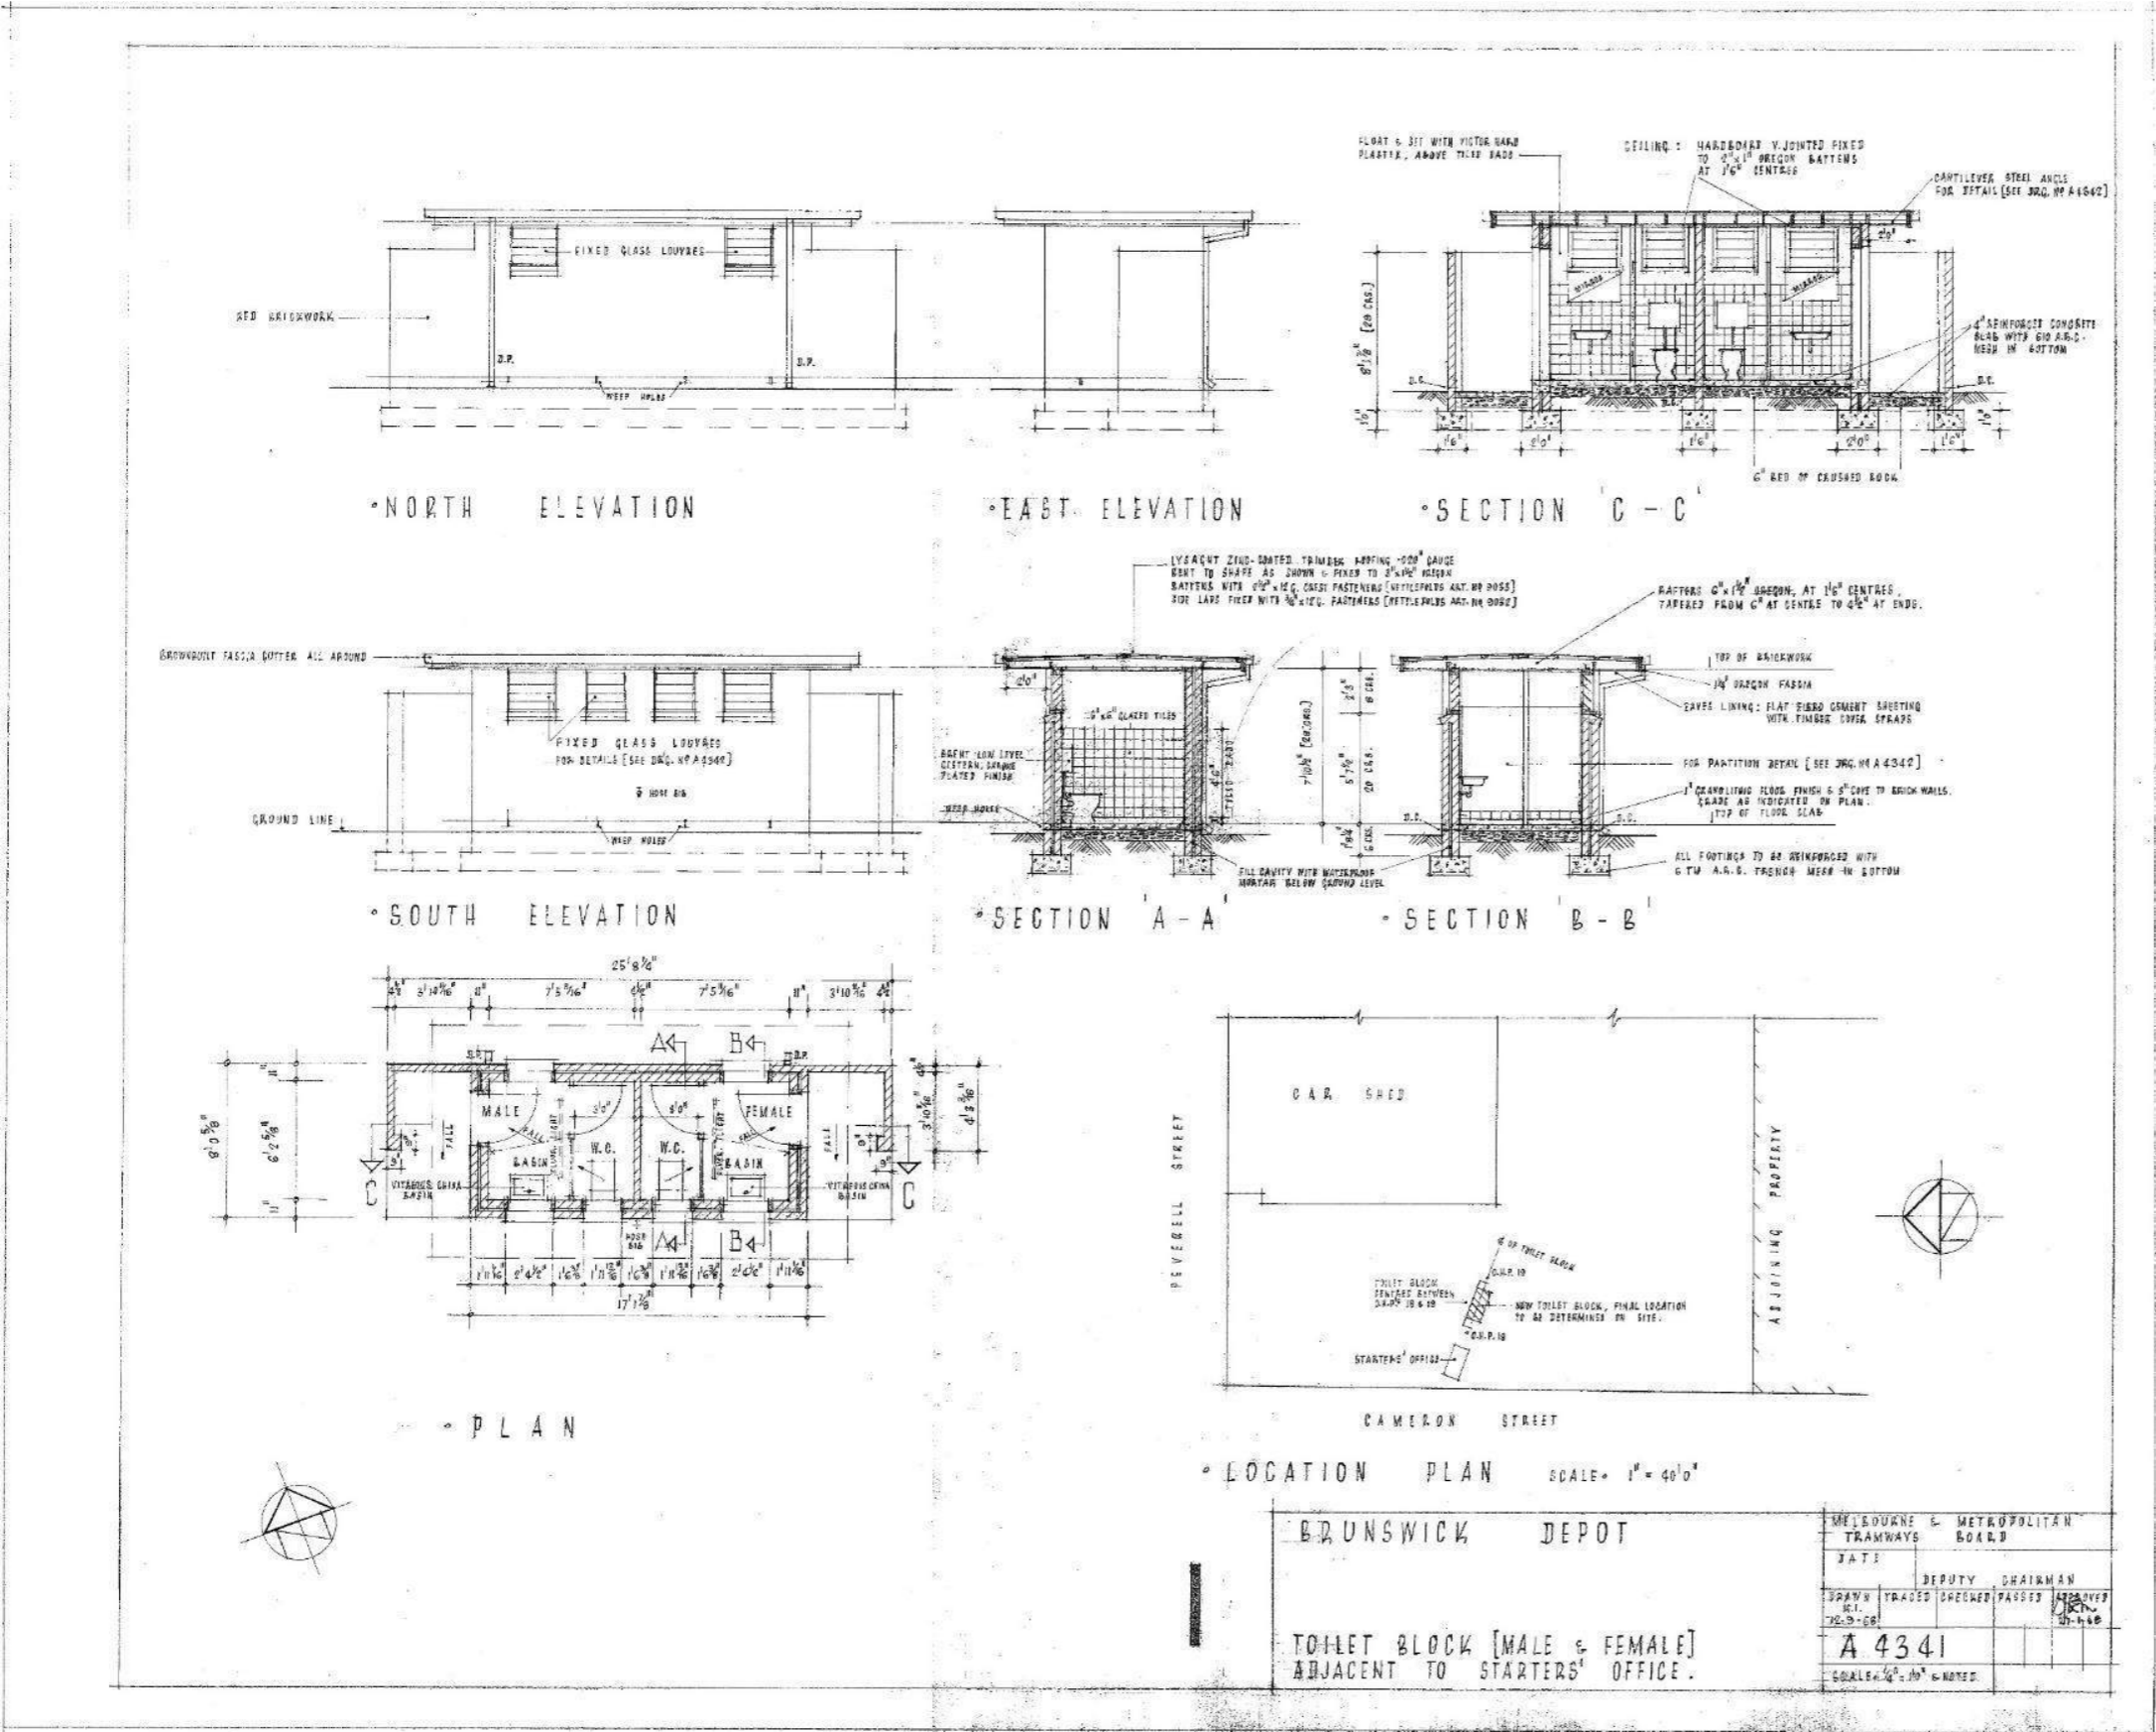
MMTB's 1935 plan of the toilet block, showing the floorplan, along with the north, south and east and exterior elevations, two interior sections, and its location behind the car shed
